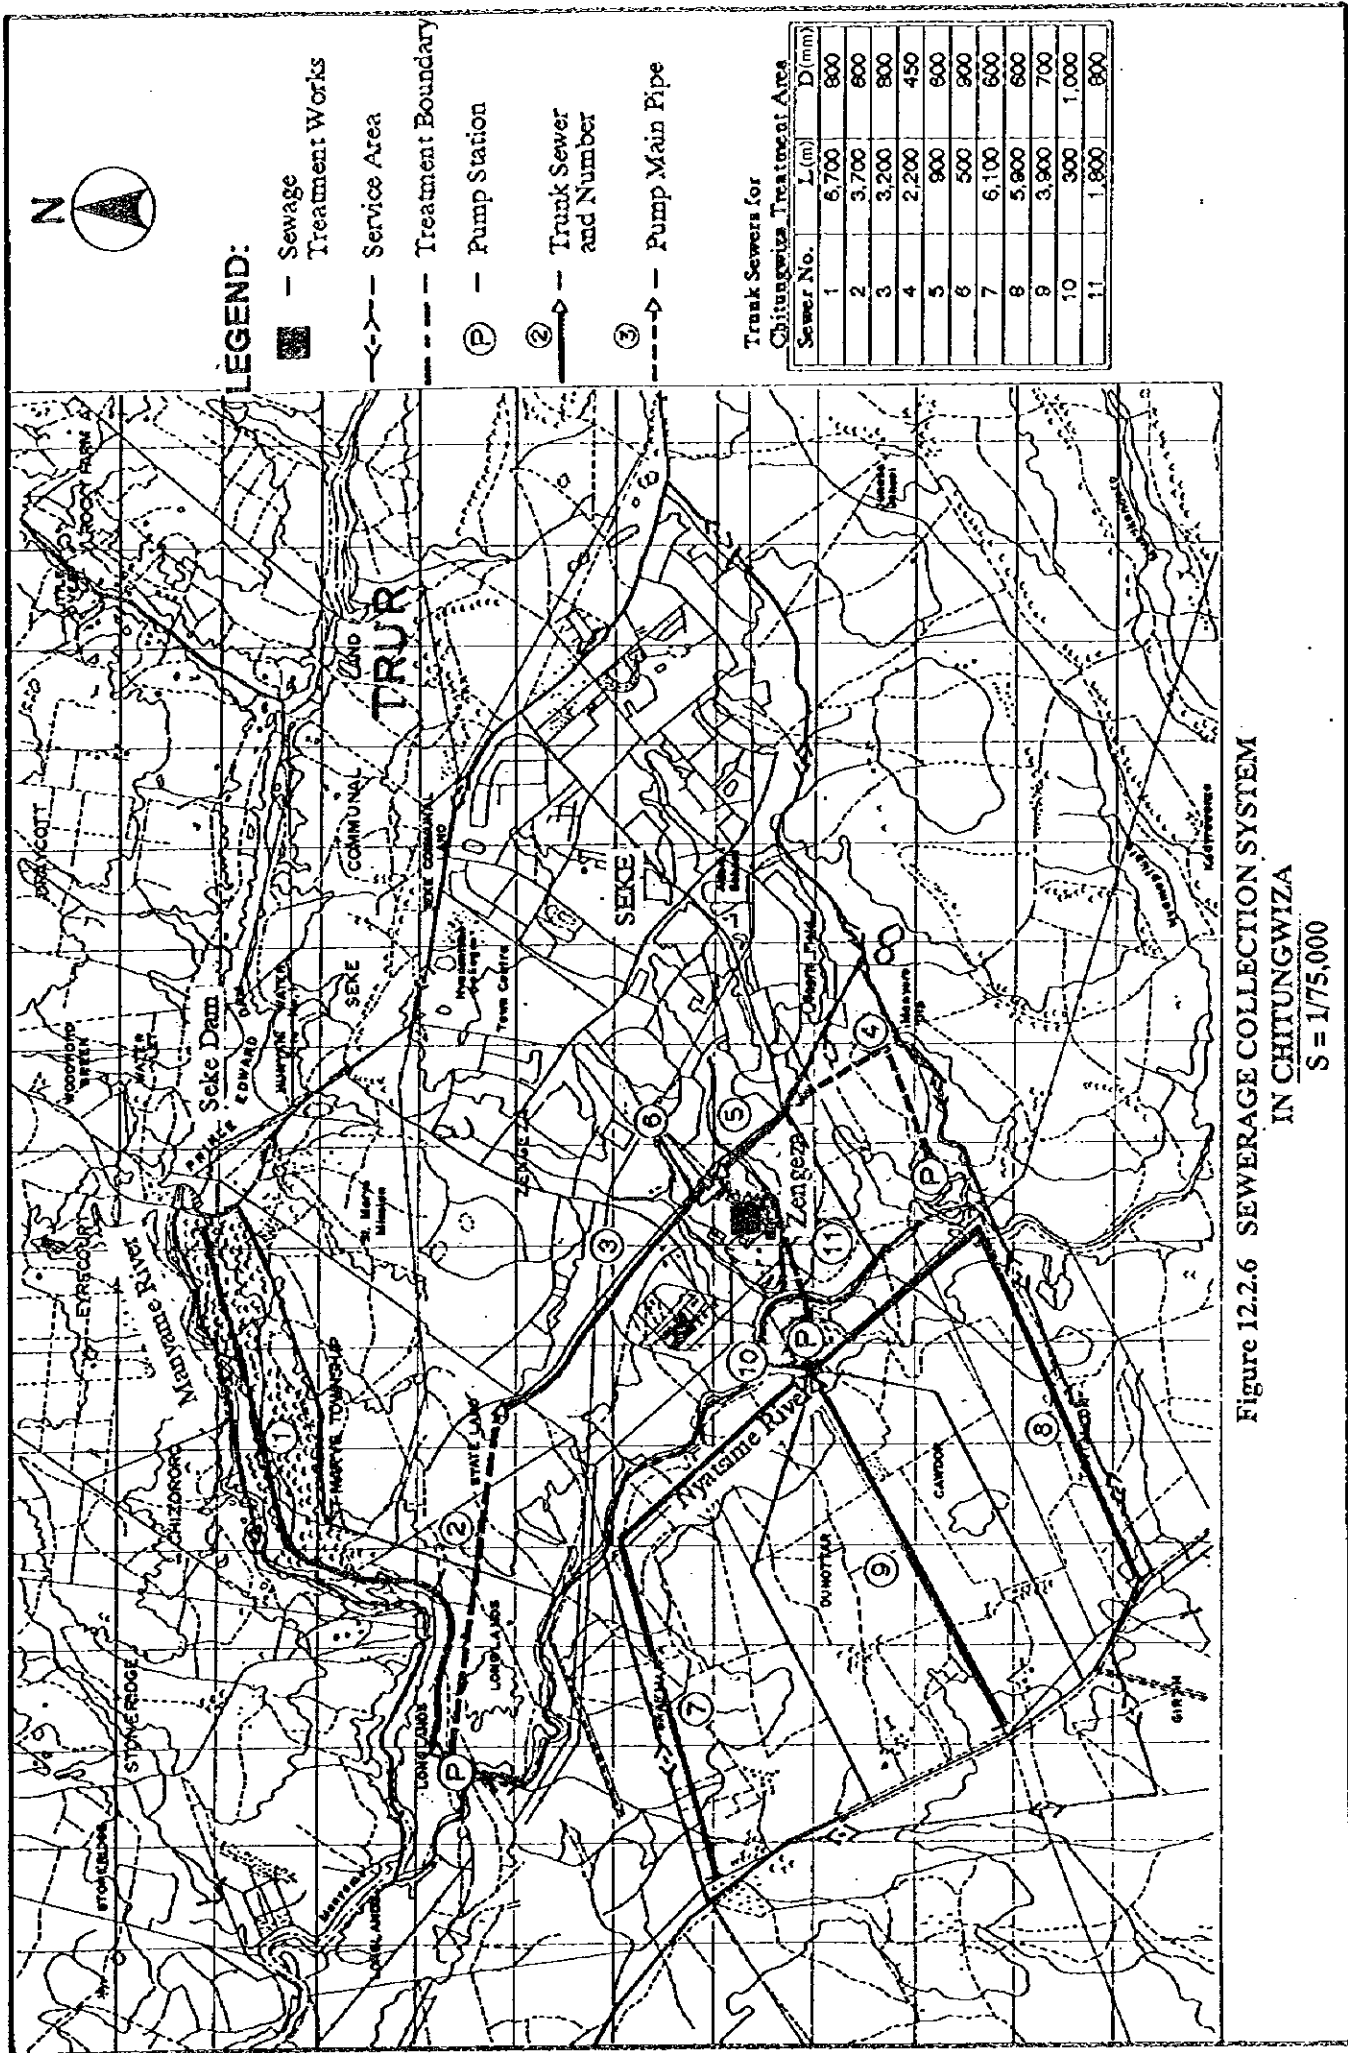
SEWERAGE COLLECTION SYSTEM
